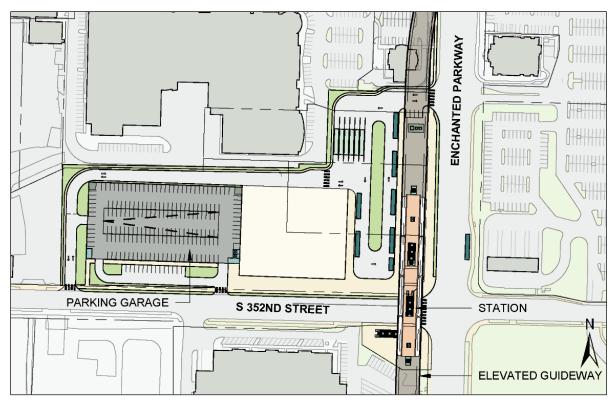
SF 352nd Span Station Option with Parking Garage
